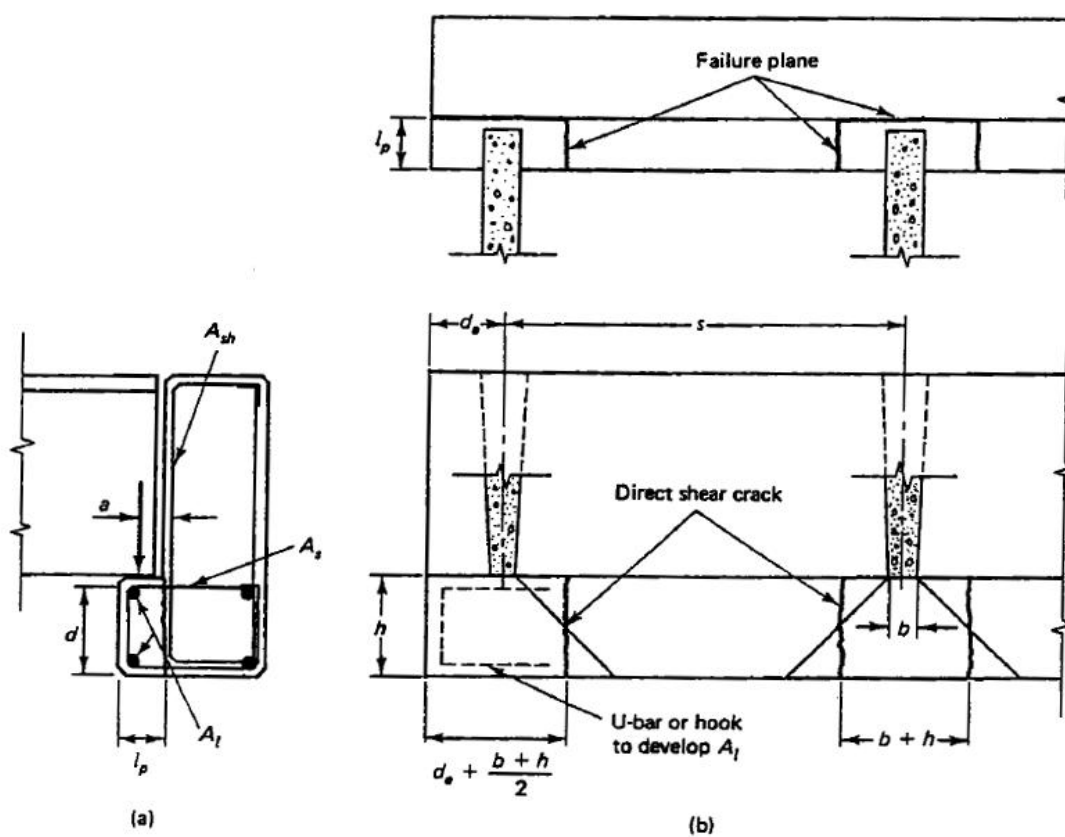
Connection design for beam ledges. (a) Ledge beam cross section. (b) Plan and elevation.
